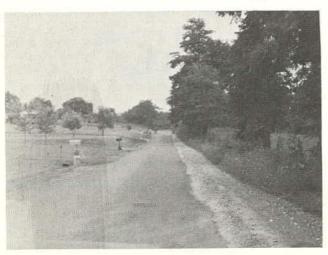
Narrow pavements requiring extensive edge and shoulder maintenance.
